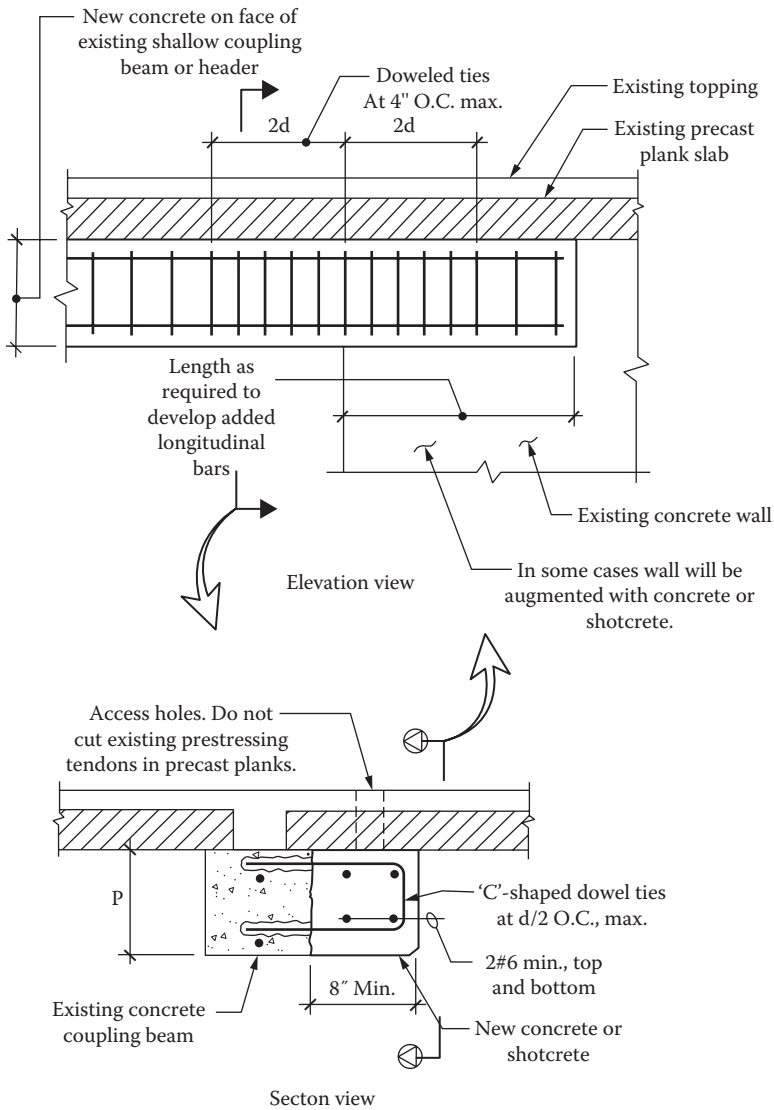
Typical strengthening of shallow coupling beam.
